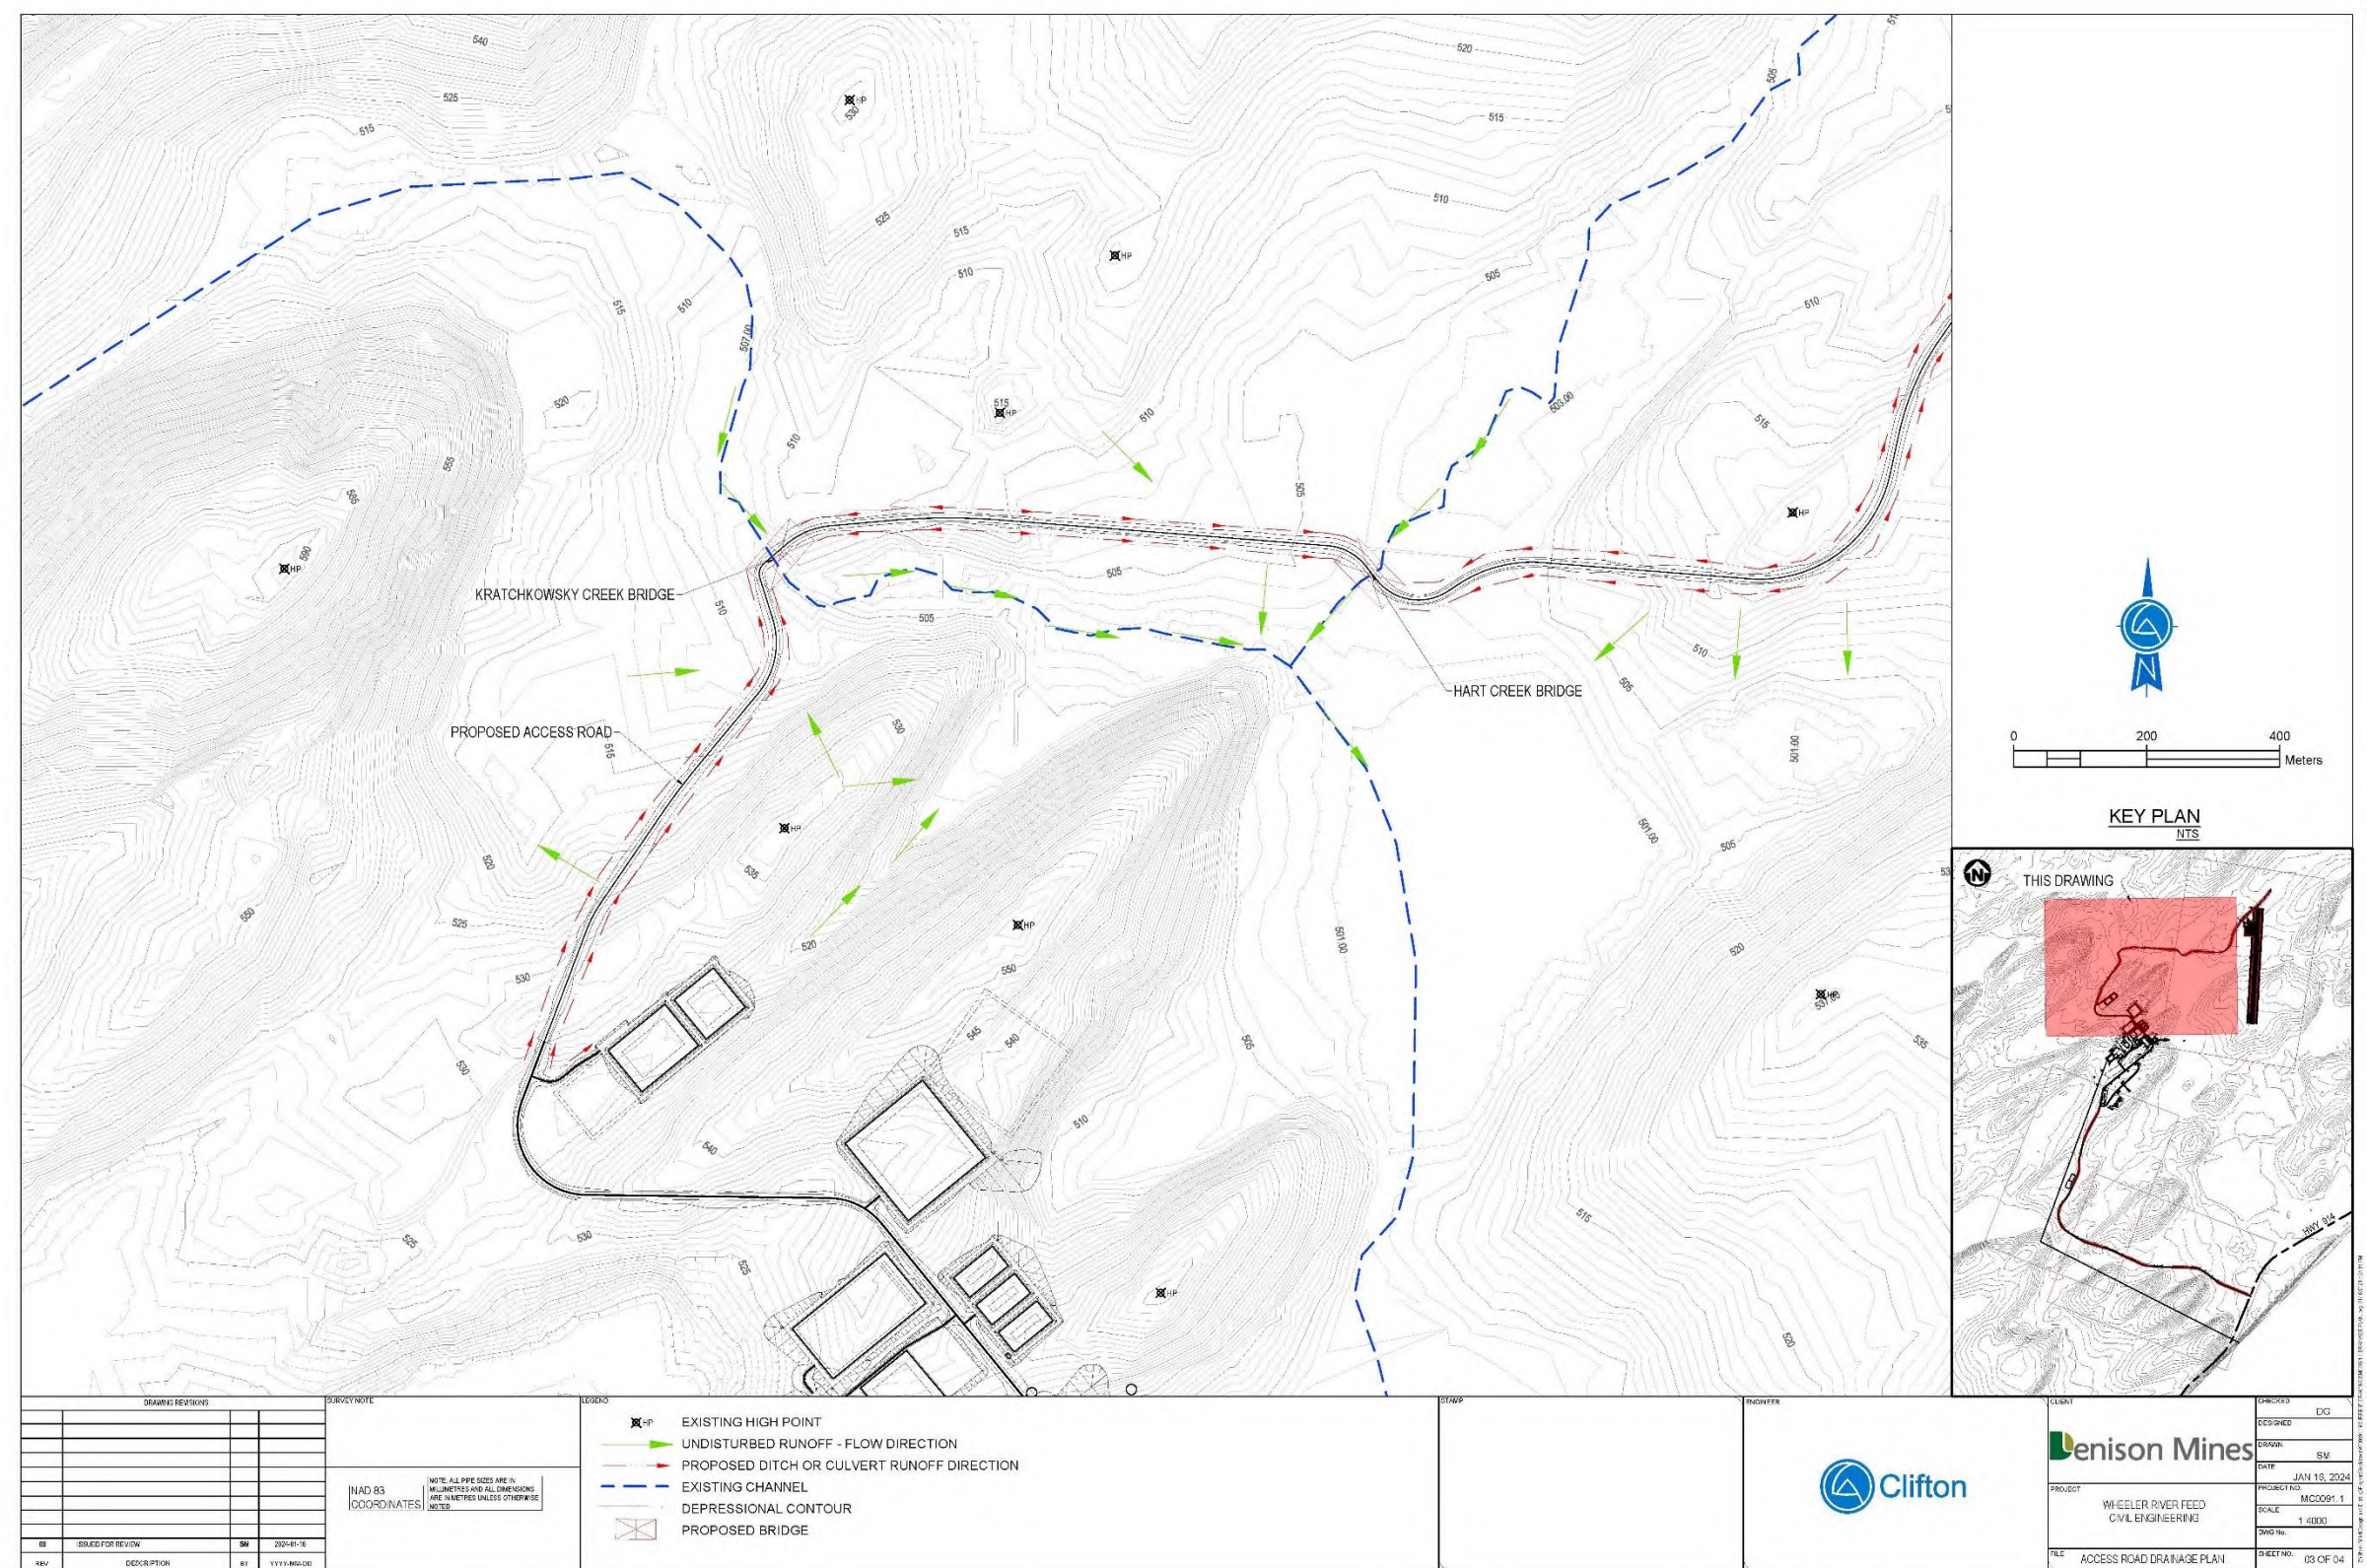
3: Conceptual Site Drainage – Road to Airstrip
